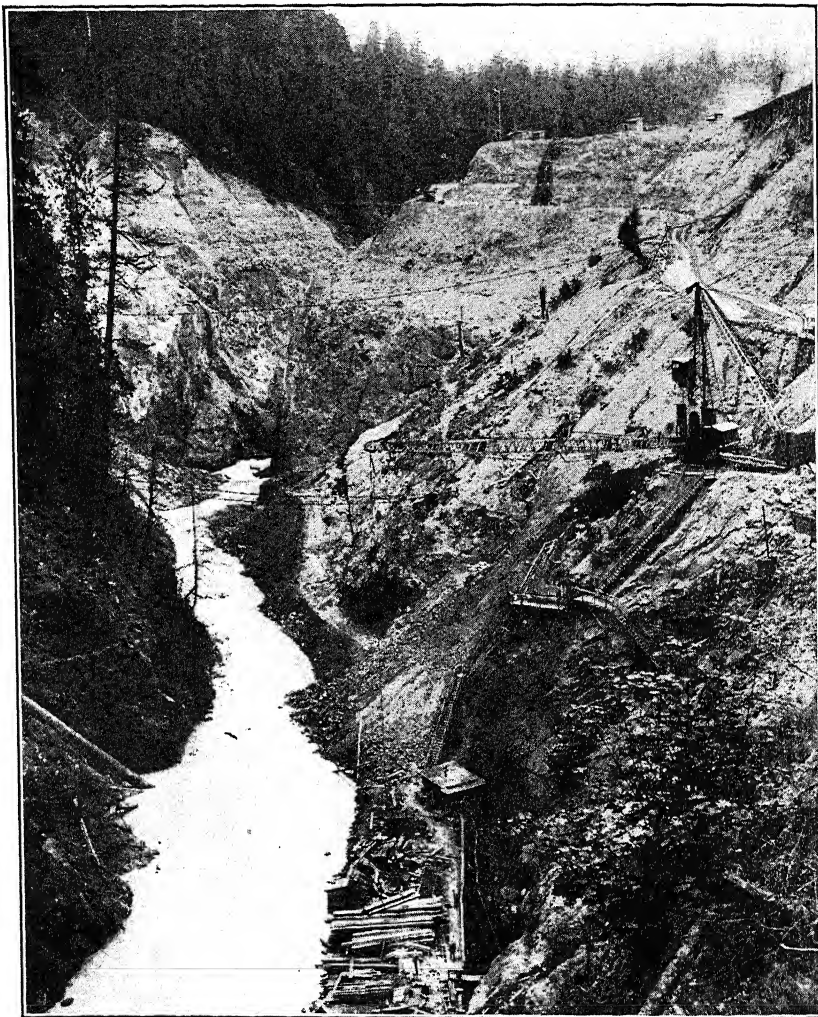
Construction at Mud Mountain Dam, a flood-control project. (*U.S. Army Engineers, Seattle District.*)
